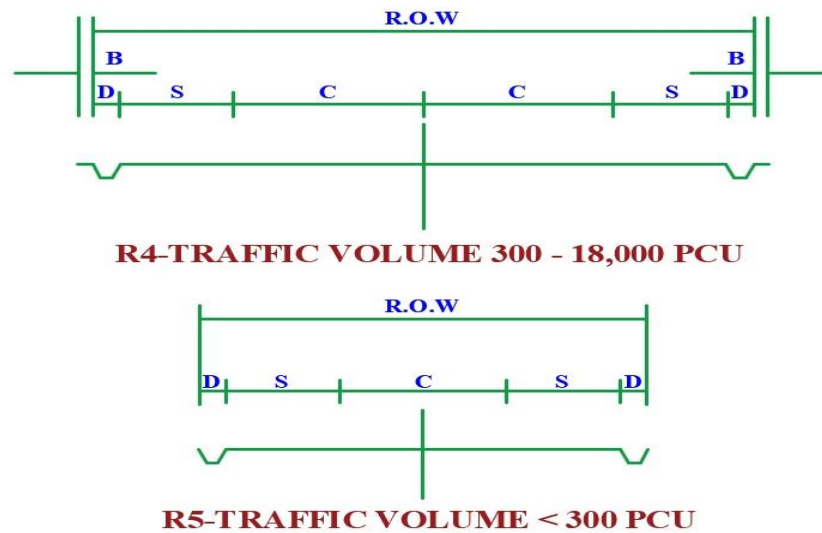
1 Typical Road cross Sections original source RDA geometric design standard
